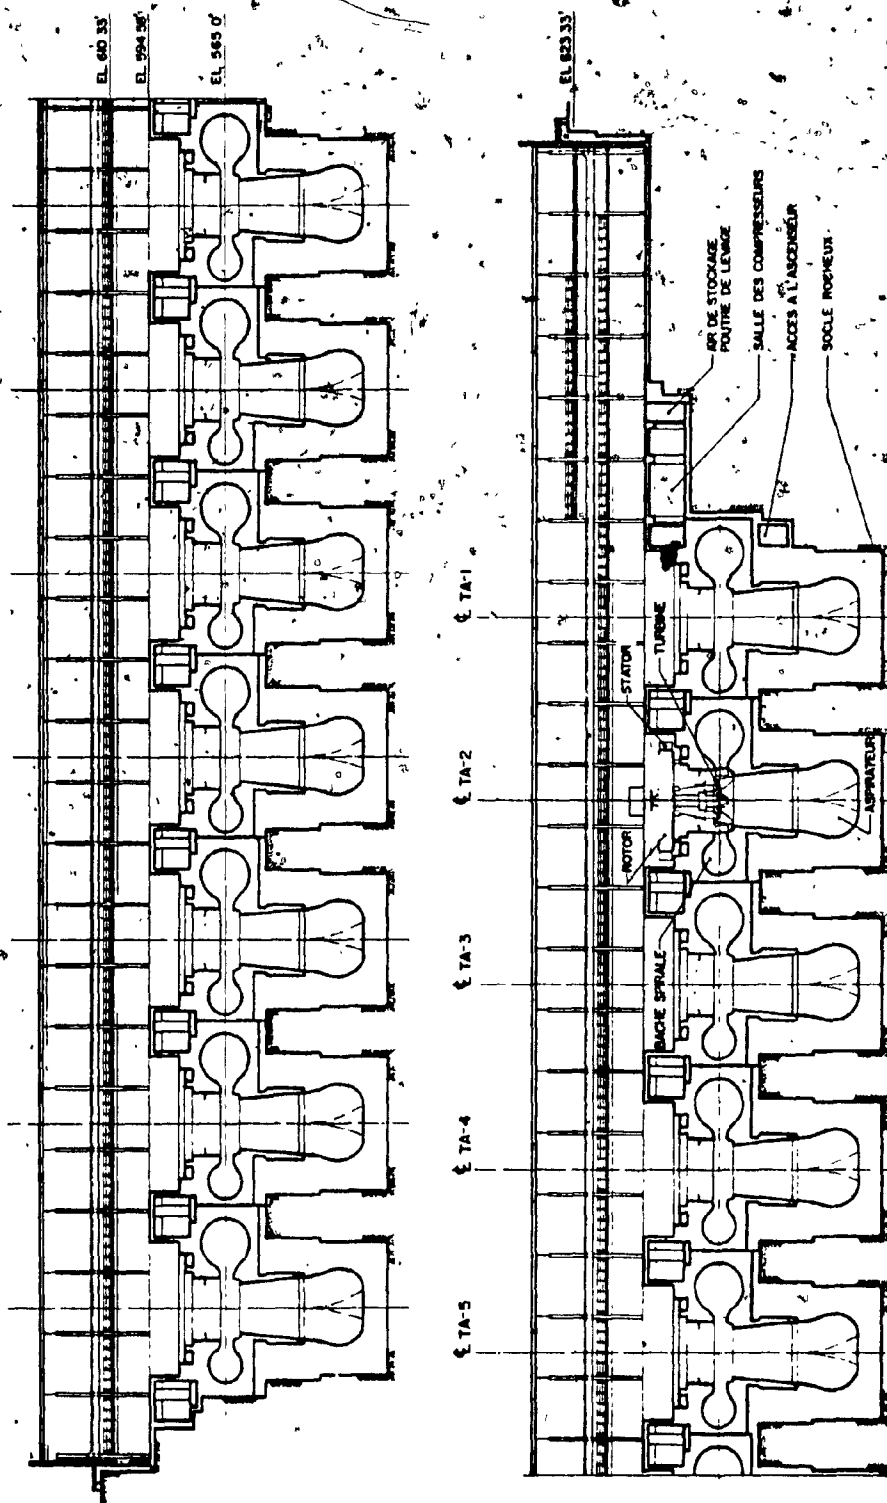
LG-3 Powerhouse Longitudinal Section.
